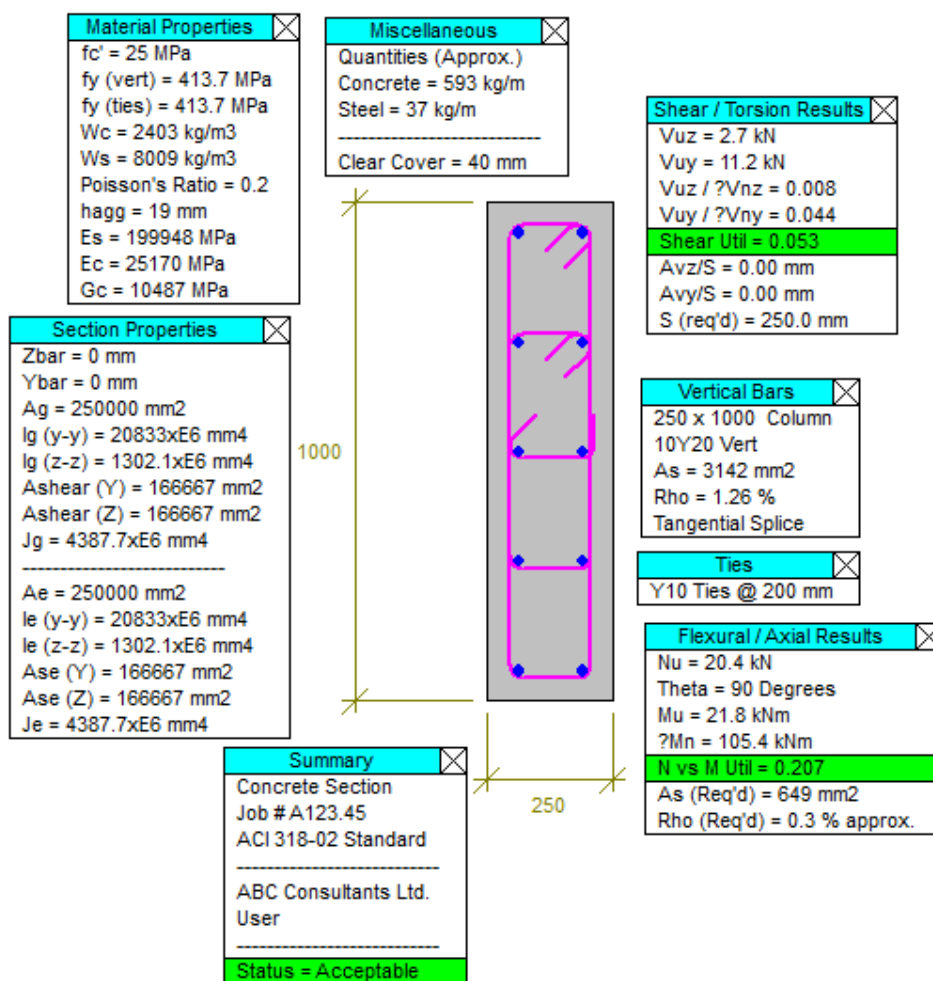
Steel reinforcement of column C13 provided by S-concrete at story 1
